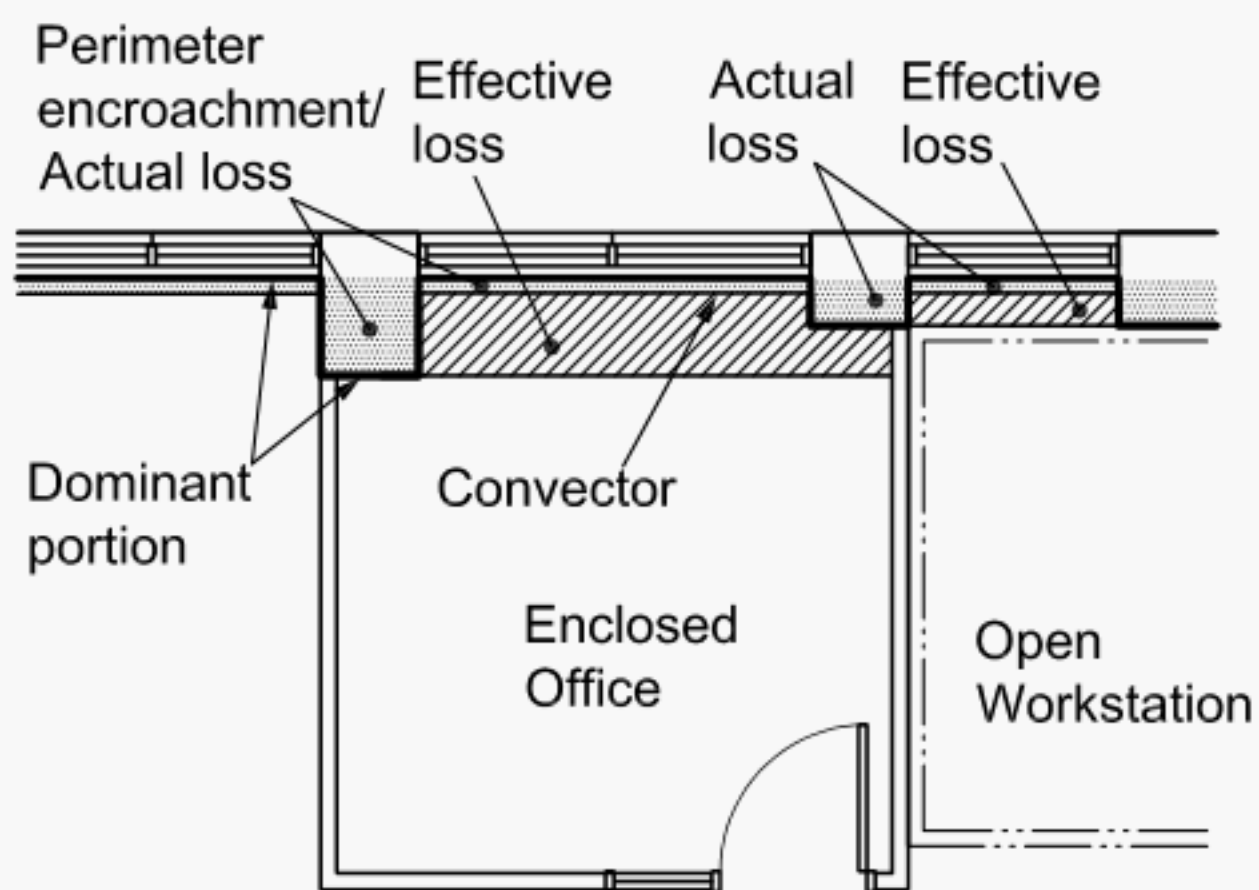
Encroachments of pilasters force workstations to be placed away from the wall
